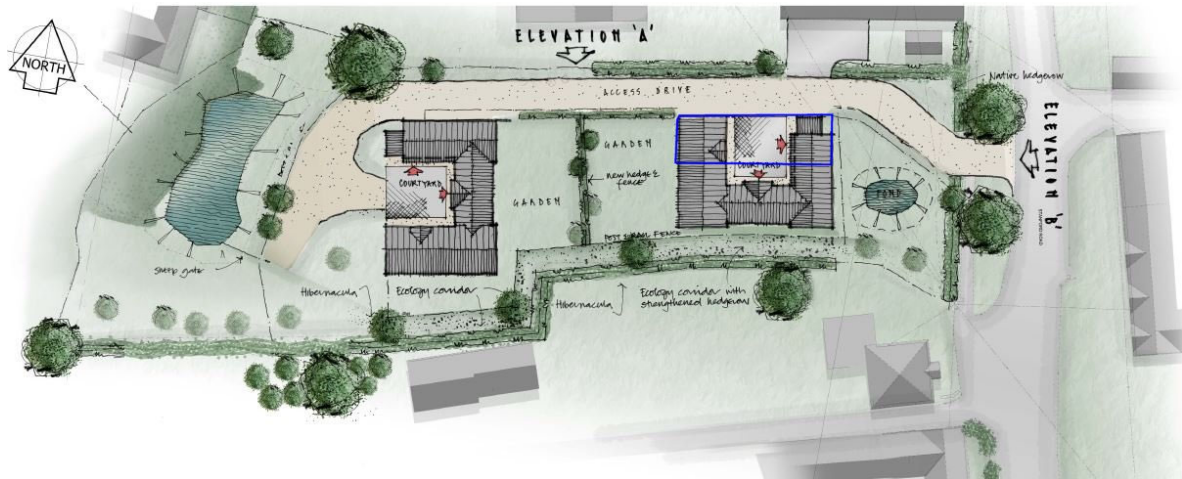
Proposed house plans with area to be stripped outlined in blue (provided by client).
